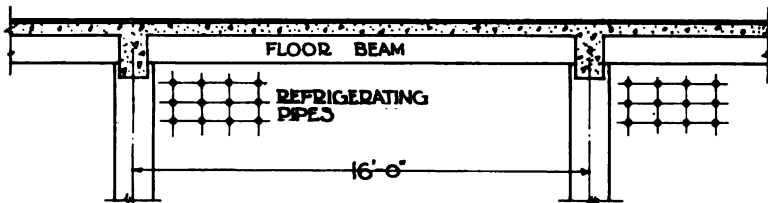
SECTION OF FLOOR WITH BEAM AND GIRDER CONSTRUCTION.
